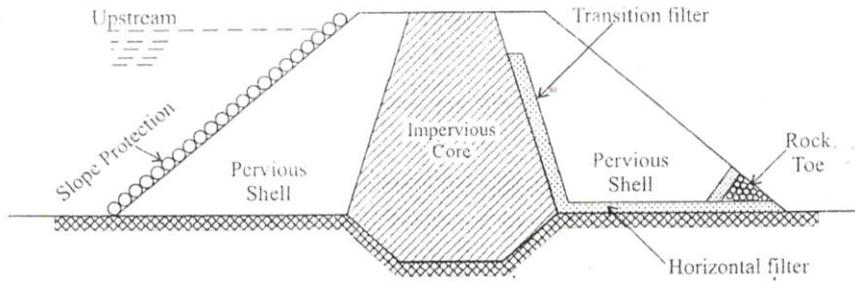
Earth dam / Non-overflow dam / Embankment dam
